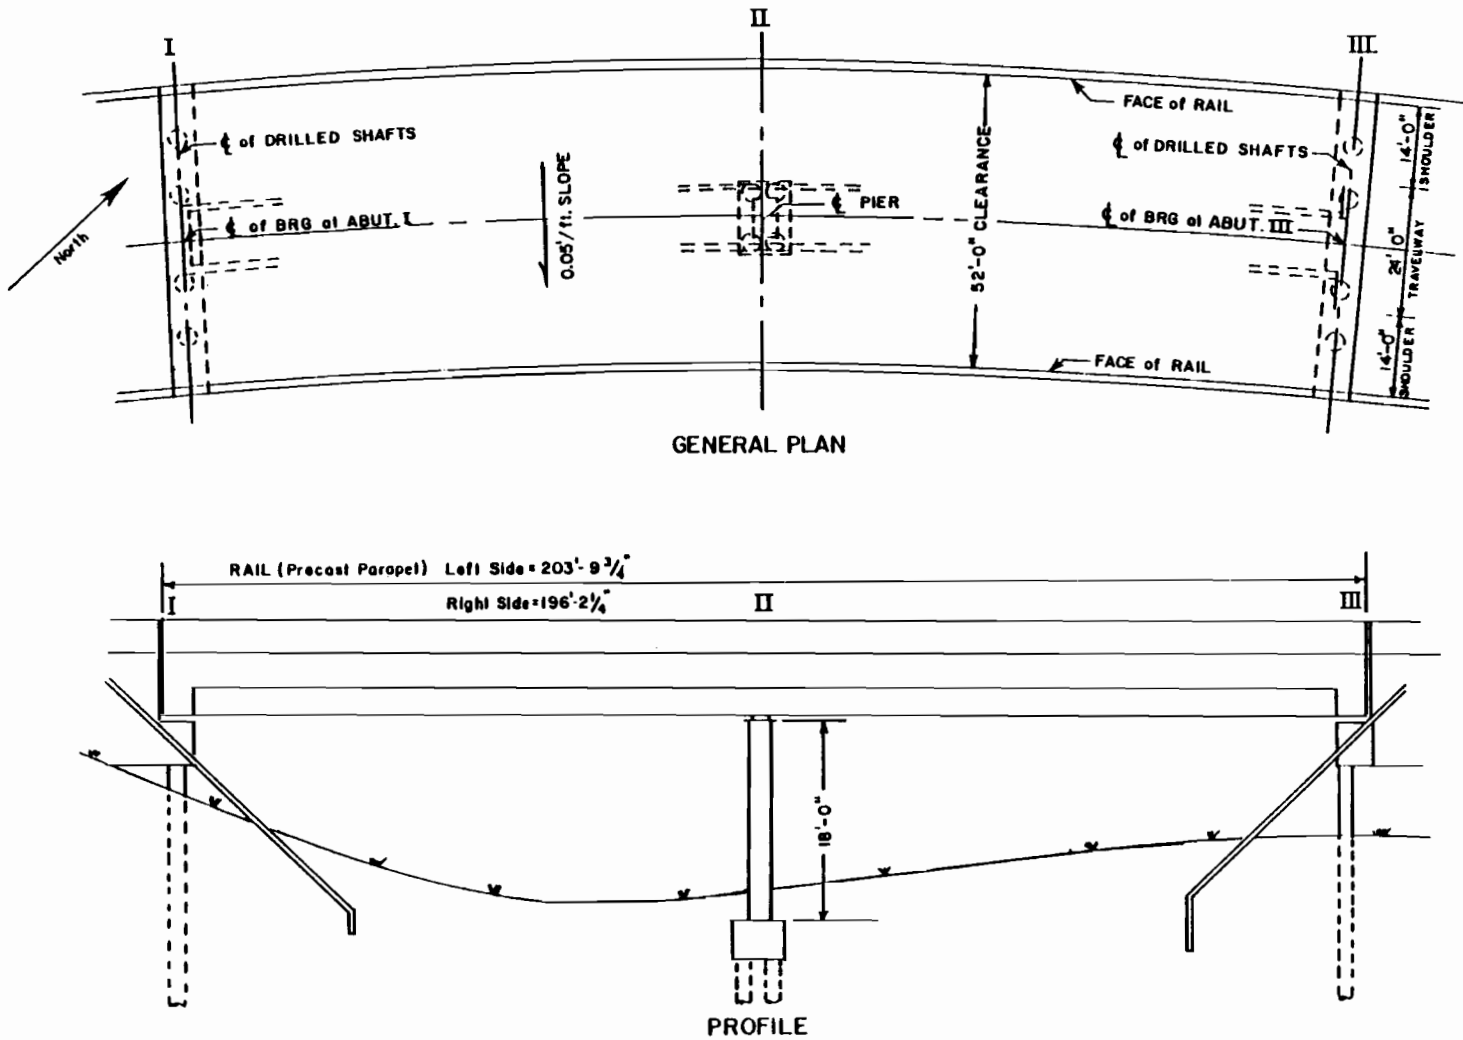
Plan and elevation views of the bridge at Bear Creek - Travis Co., Texas
